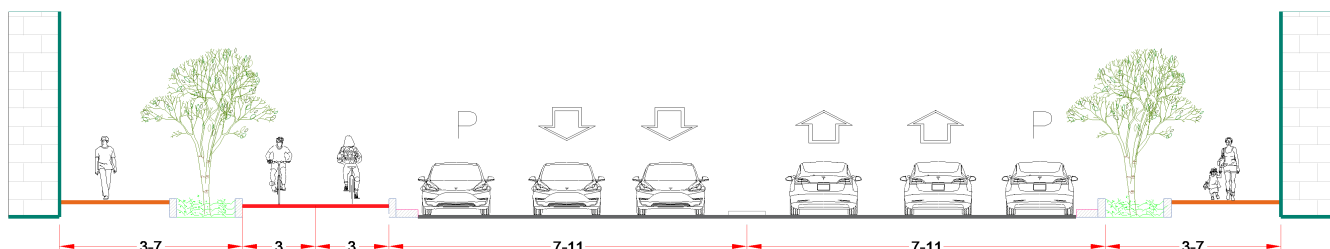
Typical cross-section and dimensioning (m) of two-way bike path (variant B) in the study area.
